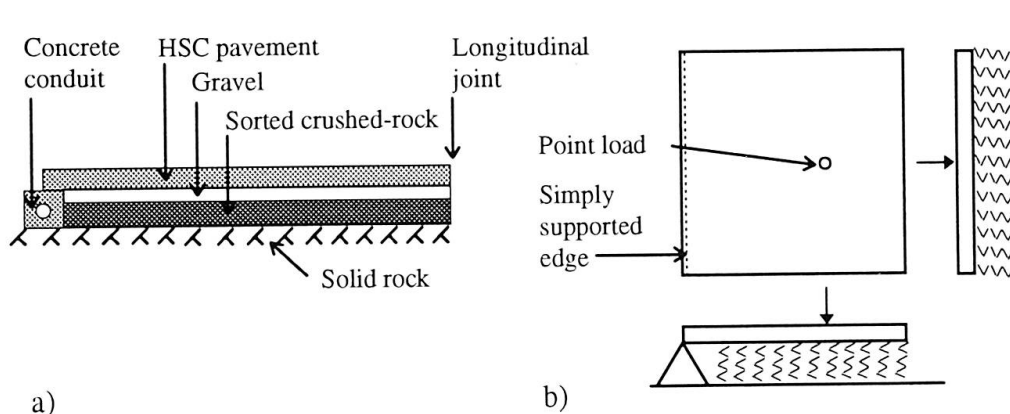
A longitudinal concrete conduit is placed on the exterior edge of the pavement (a) and model of concrete pavement with a simply supported edge and remaining parts on Winkler foundation (b).
